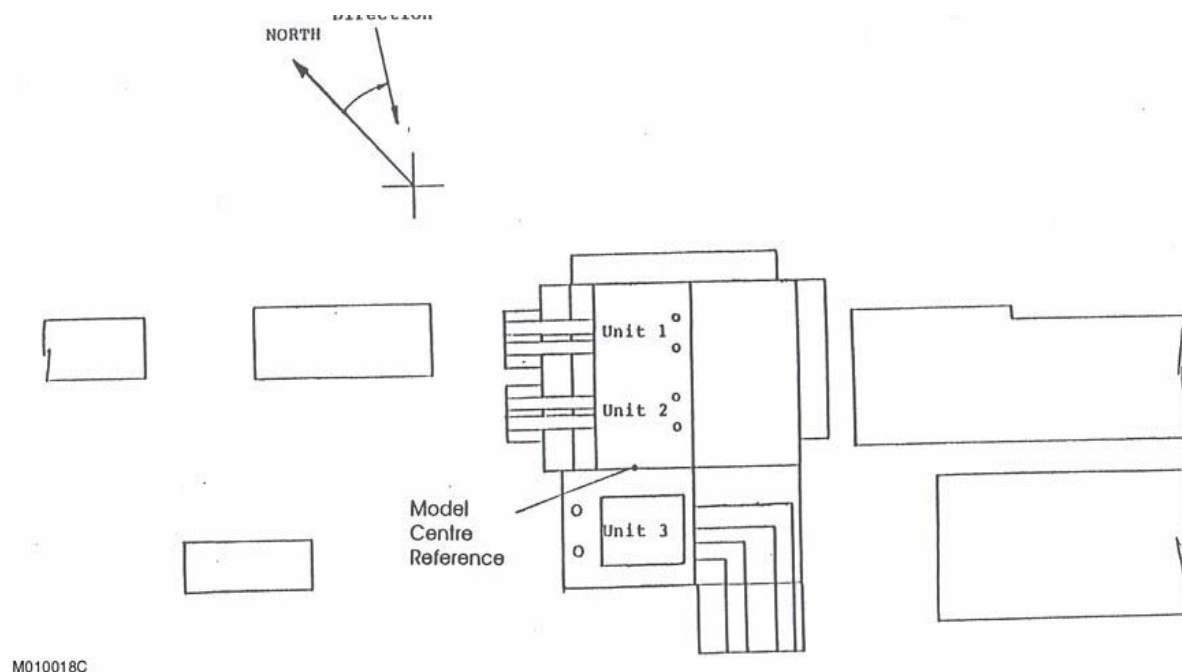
Plan view of the Lee Power Plant model and nearby buildings showing the power station units and the zero reference position used in the Monash wind tunnel tests.
